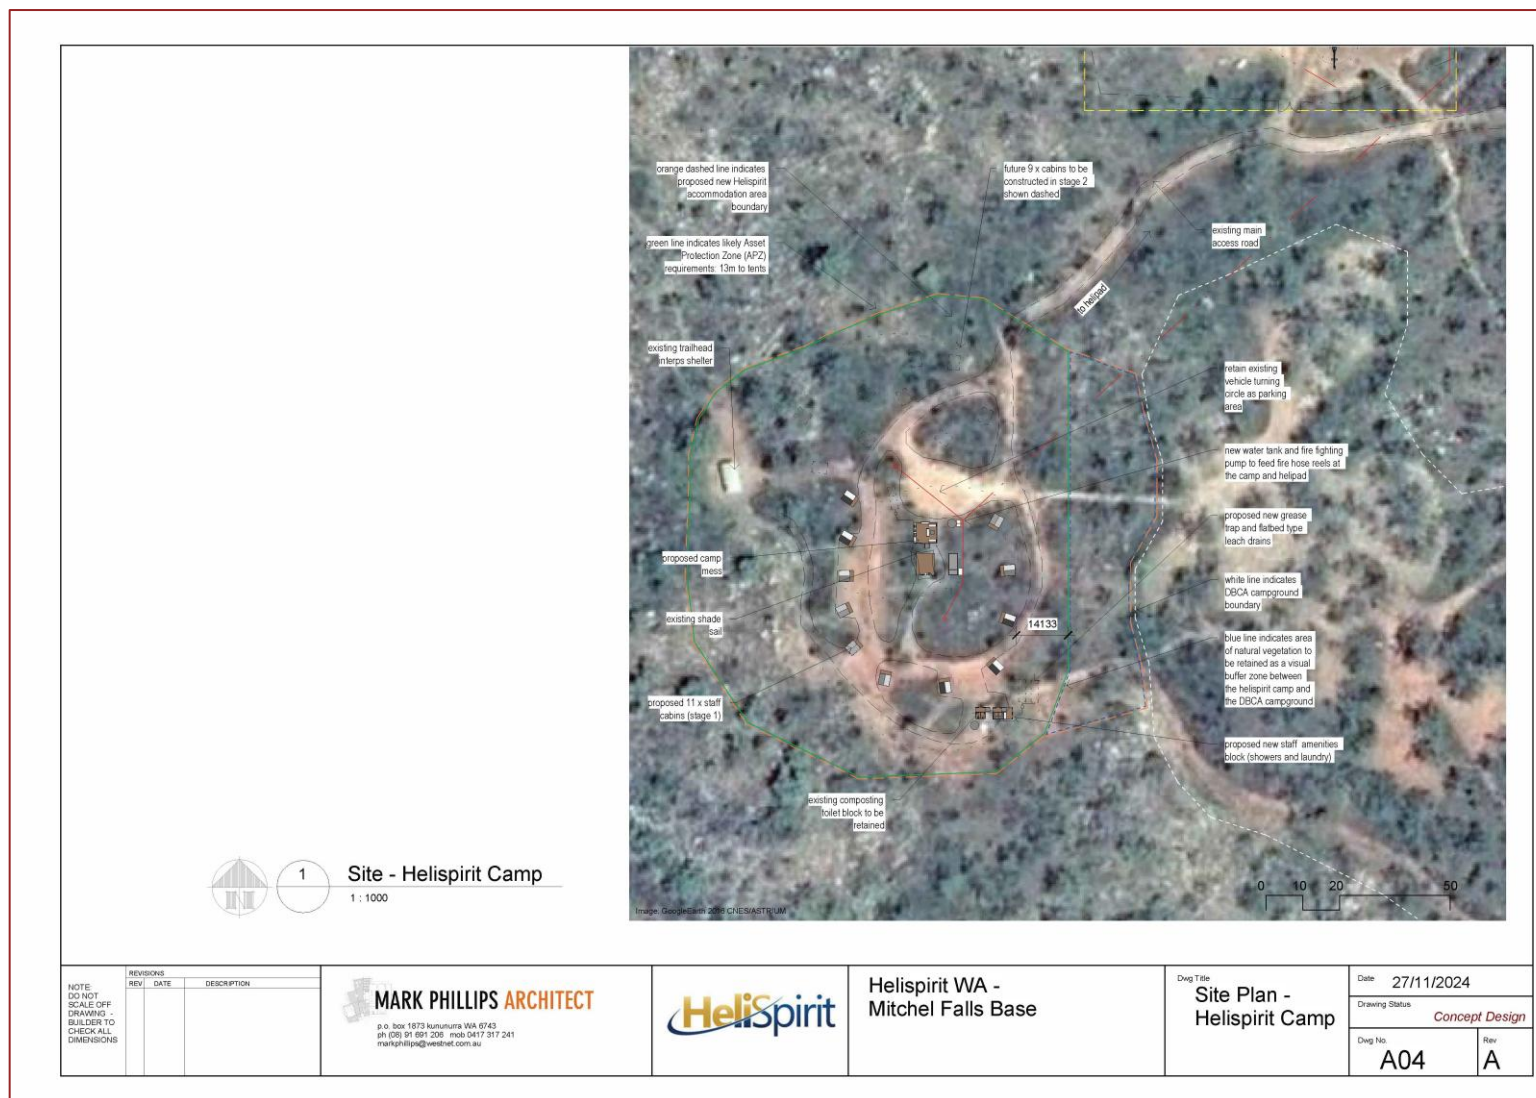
Site Plan for Mitchell Falls Helispirit Staff Camp showing existing and proposed structures
